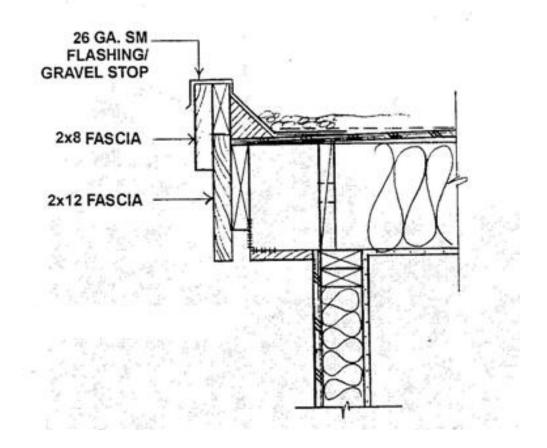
Example: Sloped Roof Fascia
